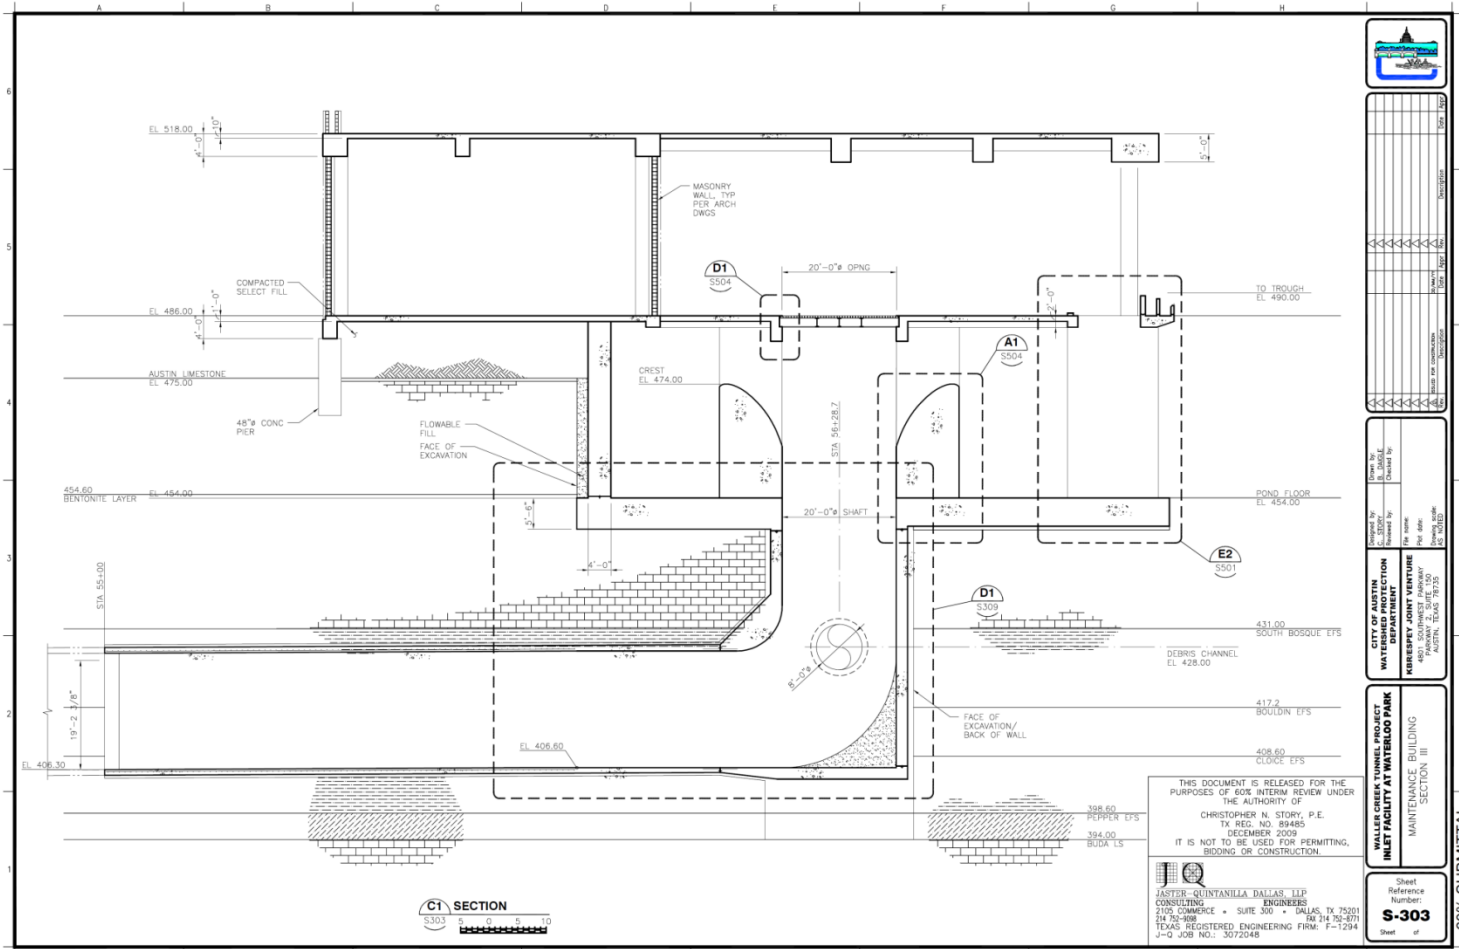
Waller Creek Tunnel Project; Morning Glory Spillway – Section
